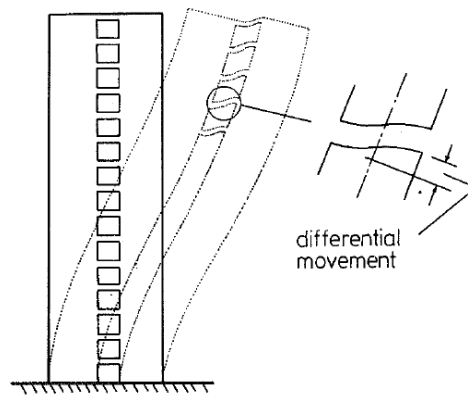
Deformed shape of a coupled wall system under earthquake loading
